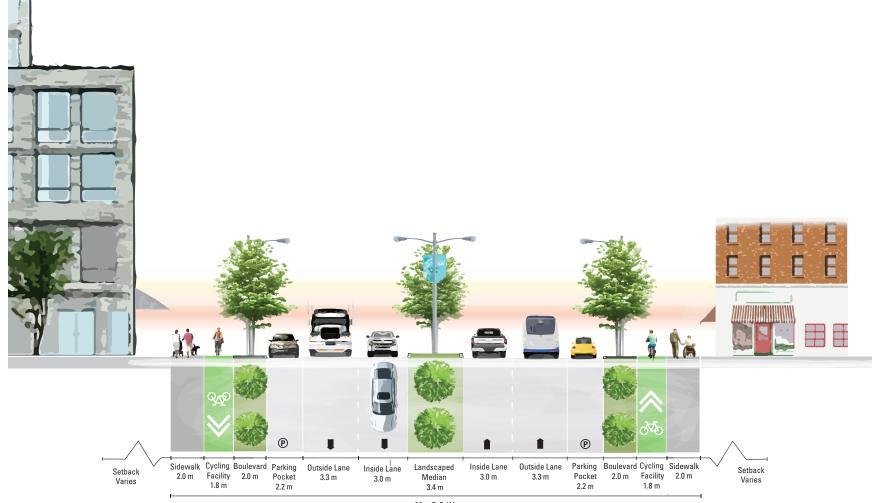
C: 138 Street/68 Avenue Proposed Cross Section
